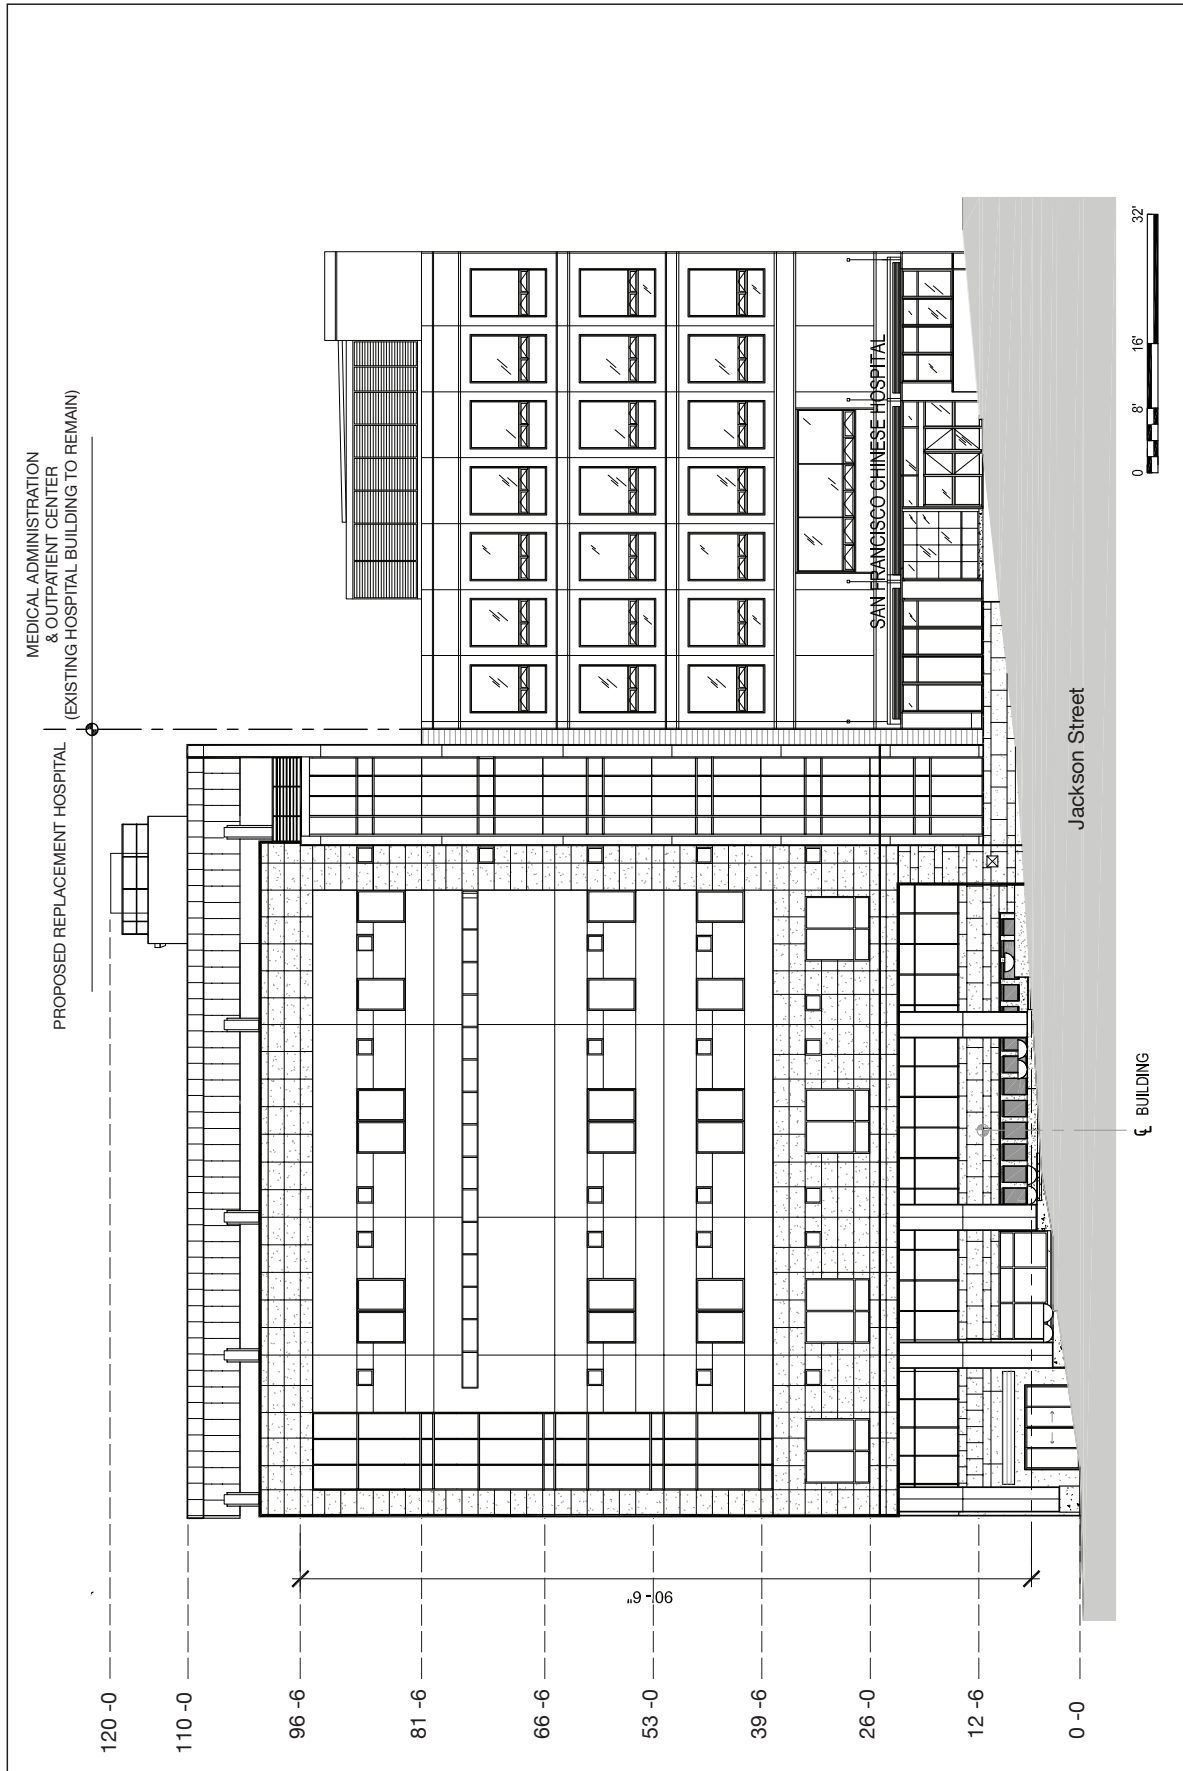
JACKSON STREET – NORTH ELEVATION
